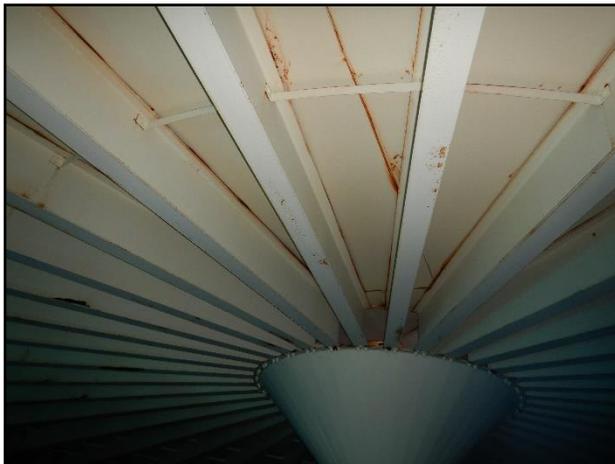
Inner rafters and center column are in VANDA Level 1 condition.
